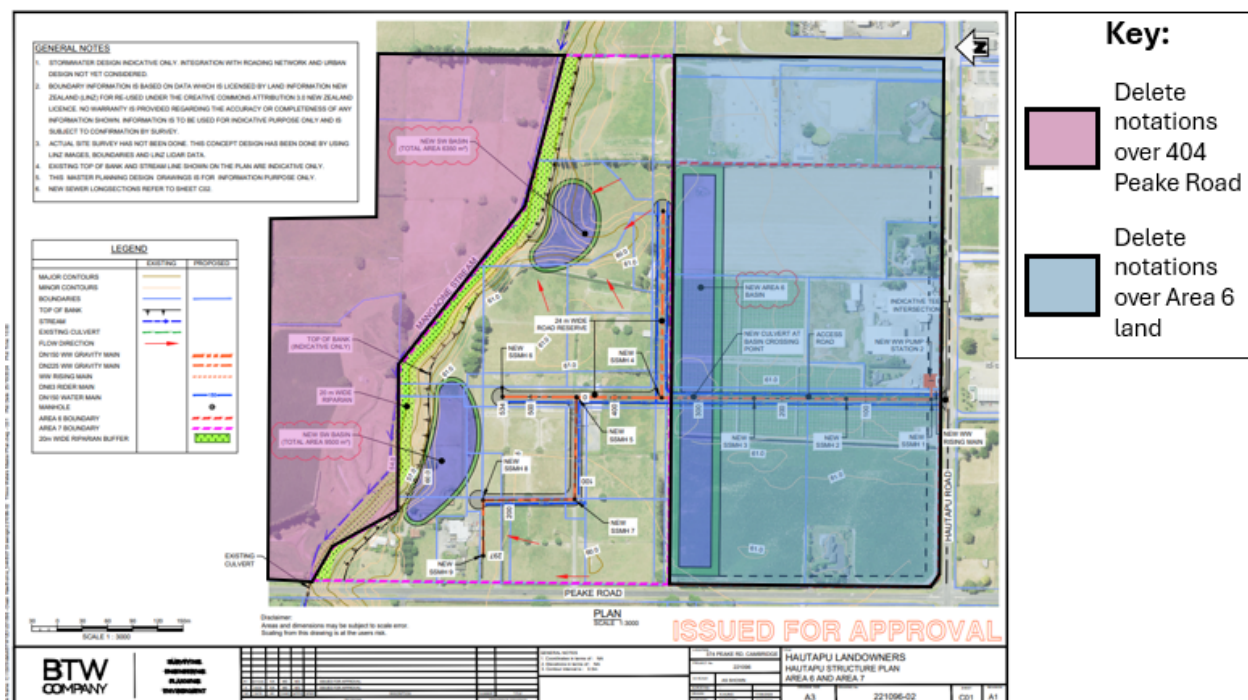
Land outside of Area 7 where notations shown on the Proposed Area 7 Structure Plan (S5.9.X) are recommended to be deleted.
